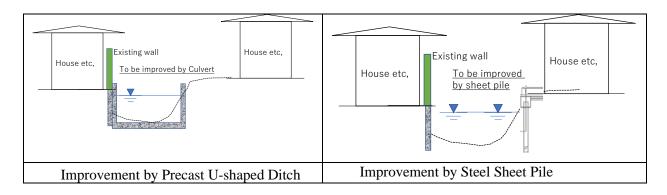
Typical Slope Protections and Those Construction Methods
